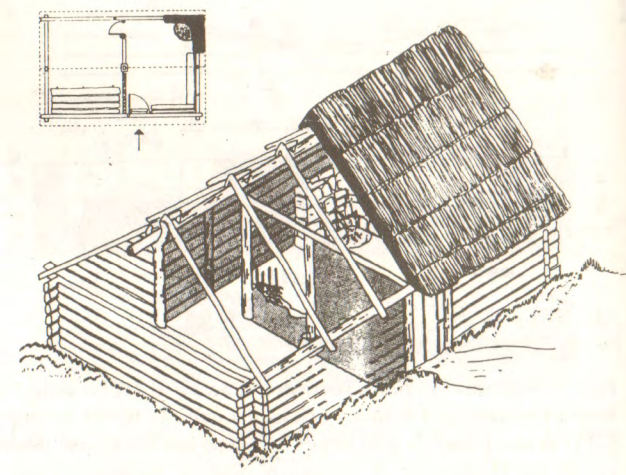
Model reconstruction of house 1, plan and axonometric view.
